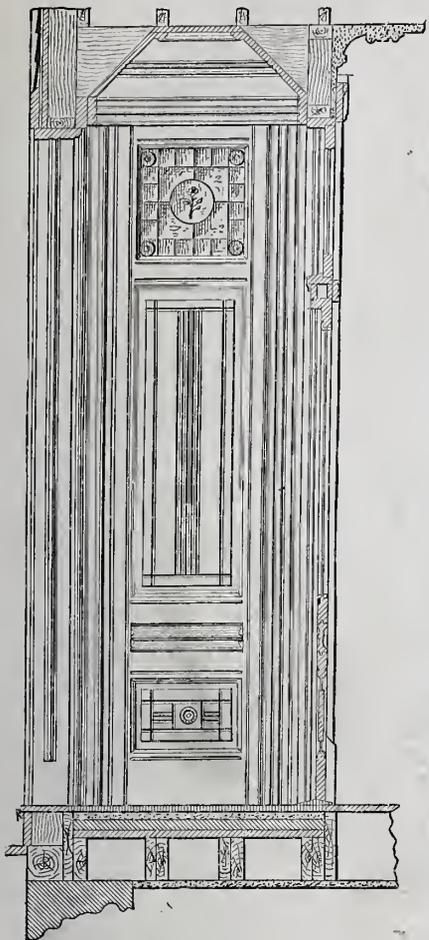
Section of Vestibule showing Storm Door Open.—Scale, 3/8 Inch to the Foot.
